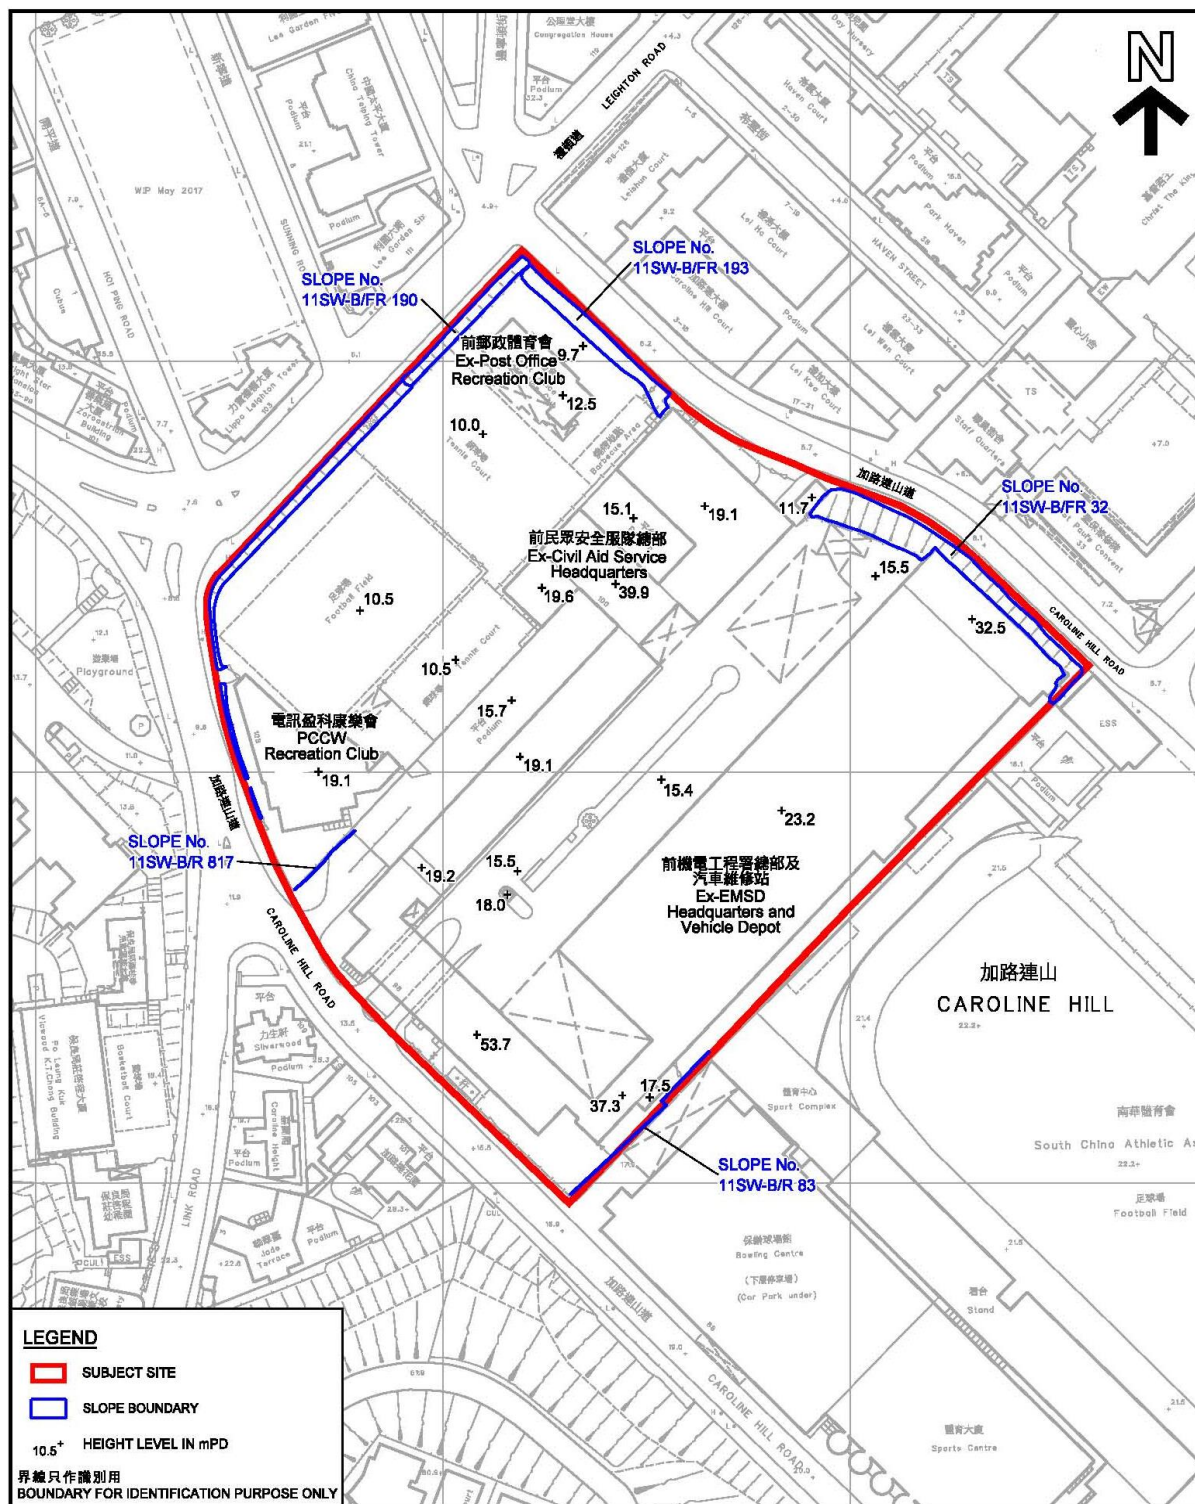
Site Plan of the Baseline Scheme (Source: Planning Department)
